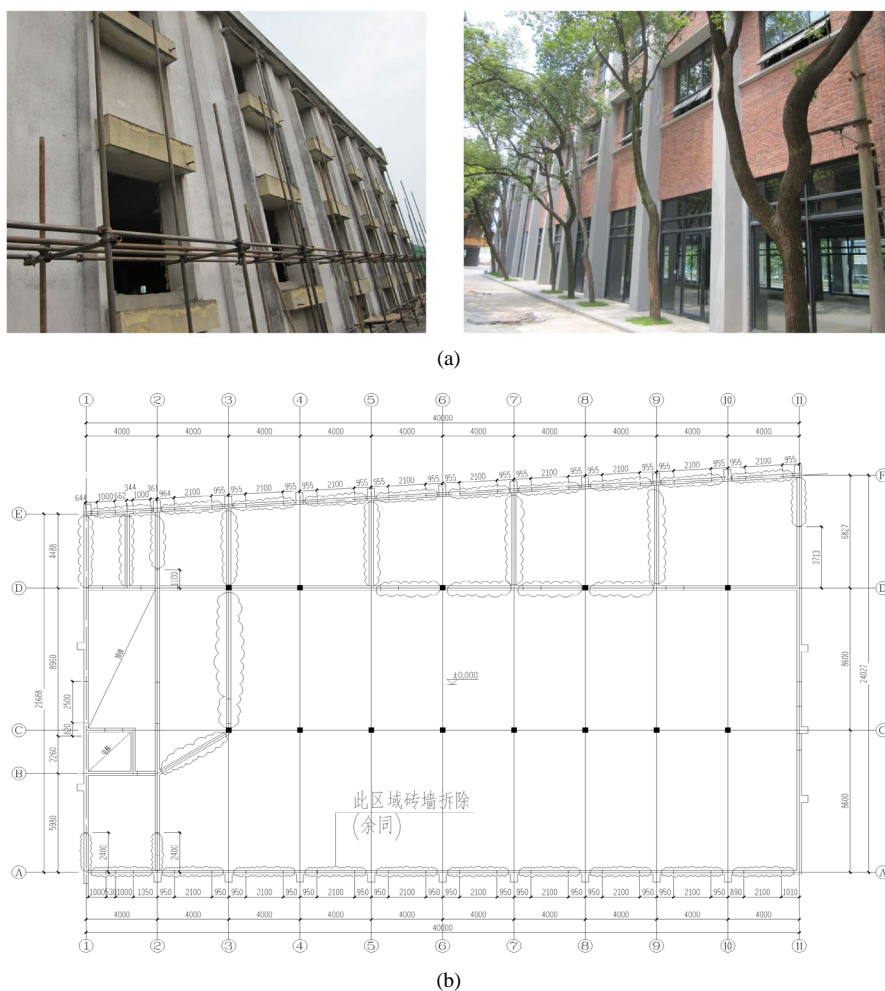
(a) Photos for reconstruction before and after; (b) Structural layout of ground floor
